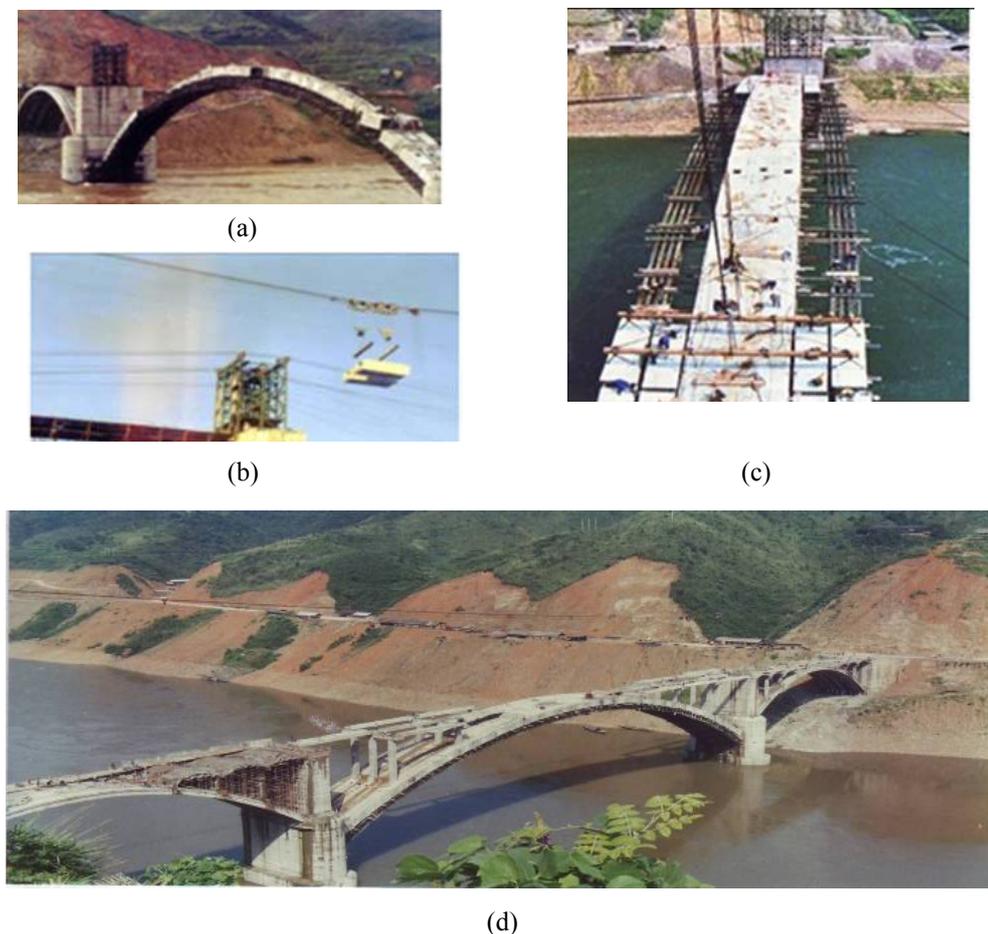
135m box arch construction(a)Erection of No.2 box blocks after No.1 boxes, (b)Erecting box block by cable over the tower top, (c)Erection of No.3 and No.4 connection of after connection of middle three boxes, (d)Erection of columns and hollow slabs on the top of arch
